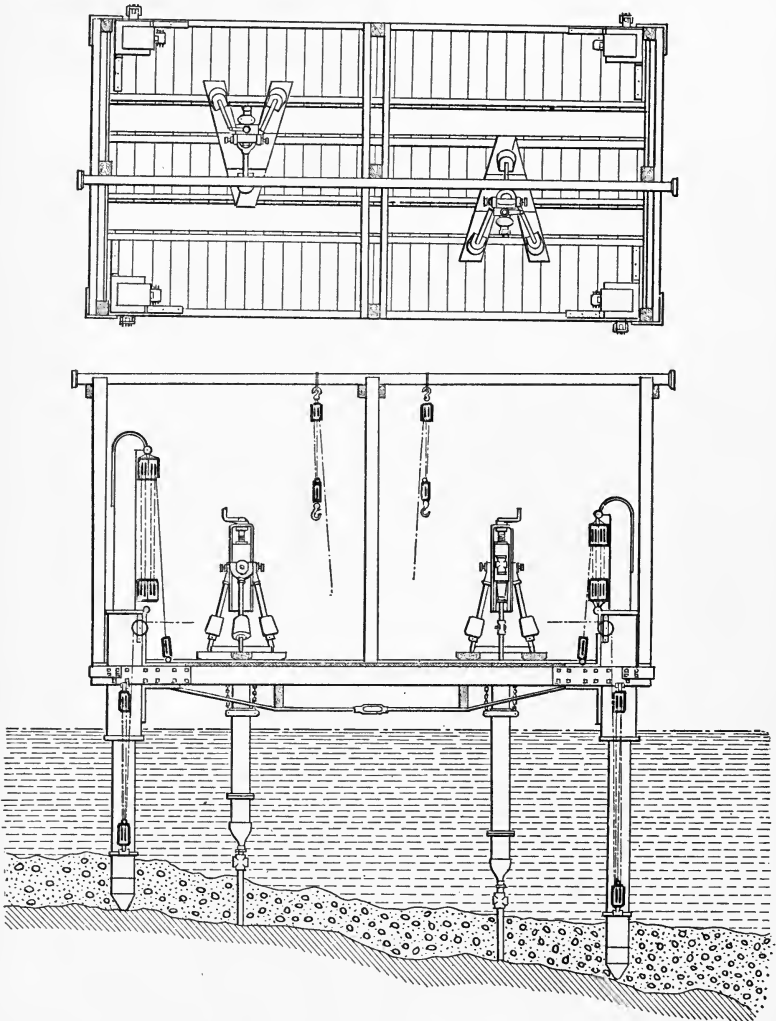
Platform for subaqueous drilling. (Courtesy of Ingersoll-Rand Co.)
